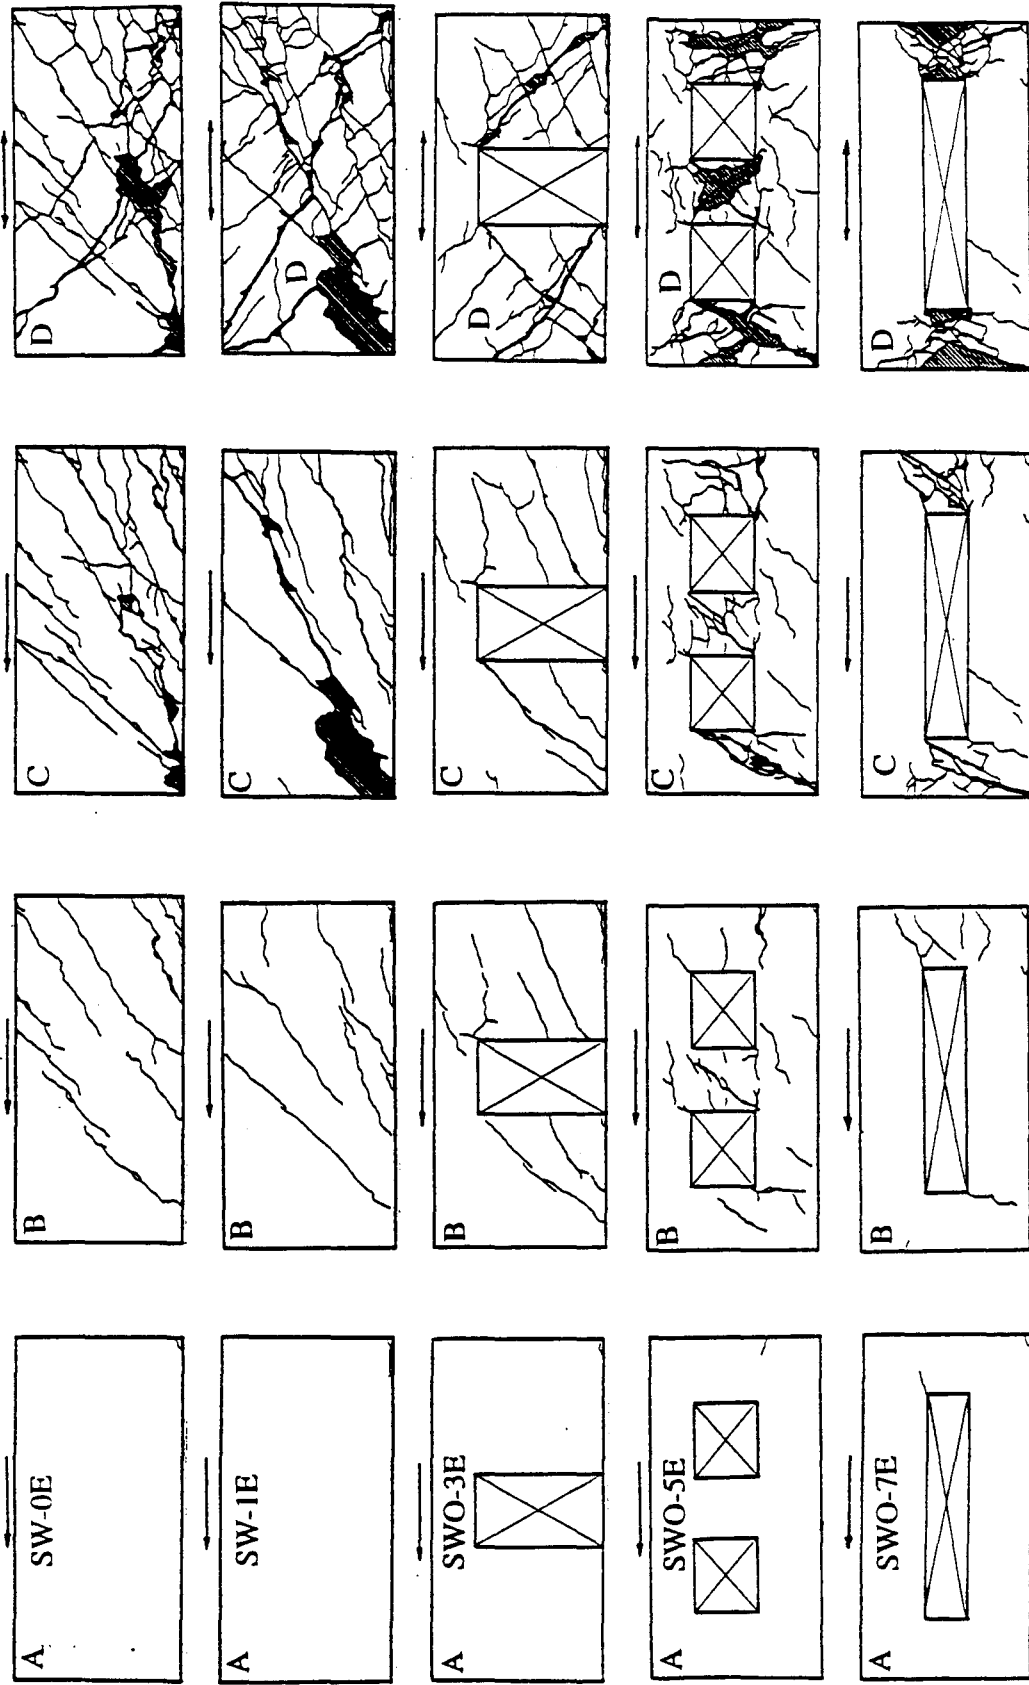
Development of crack (a) Elastic stage (A); (b) Cracking stage (B); (c) Yielding stage (C); (d) Failure stage (D) for NCKU shear walls
